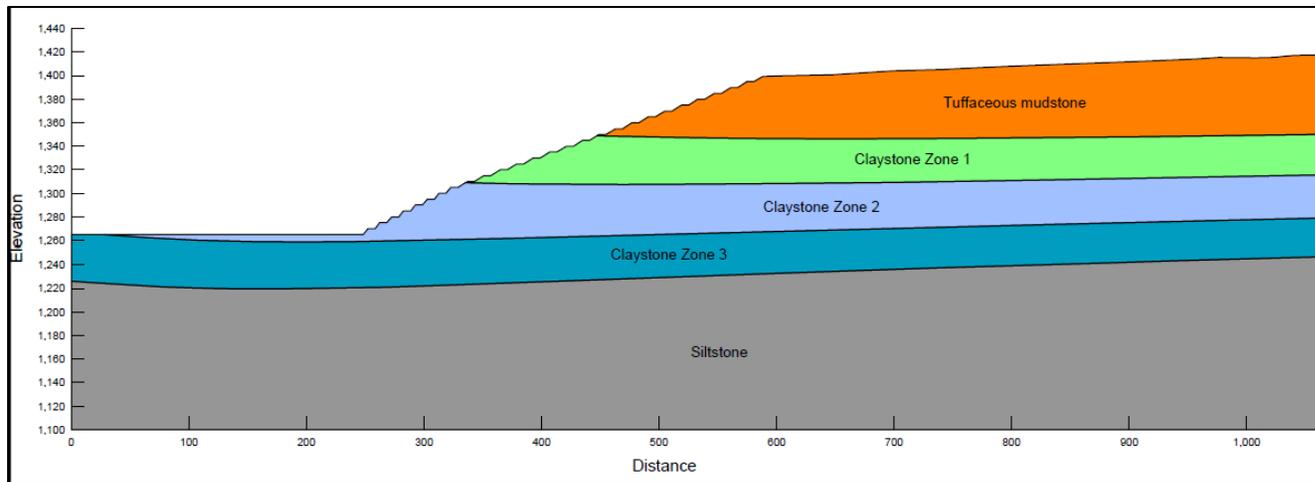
General Pit Stability Cross Section B (Source: GRE, 2023)
